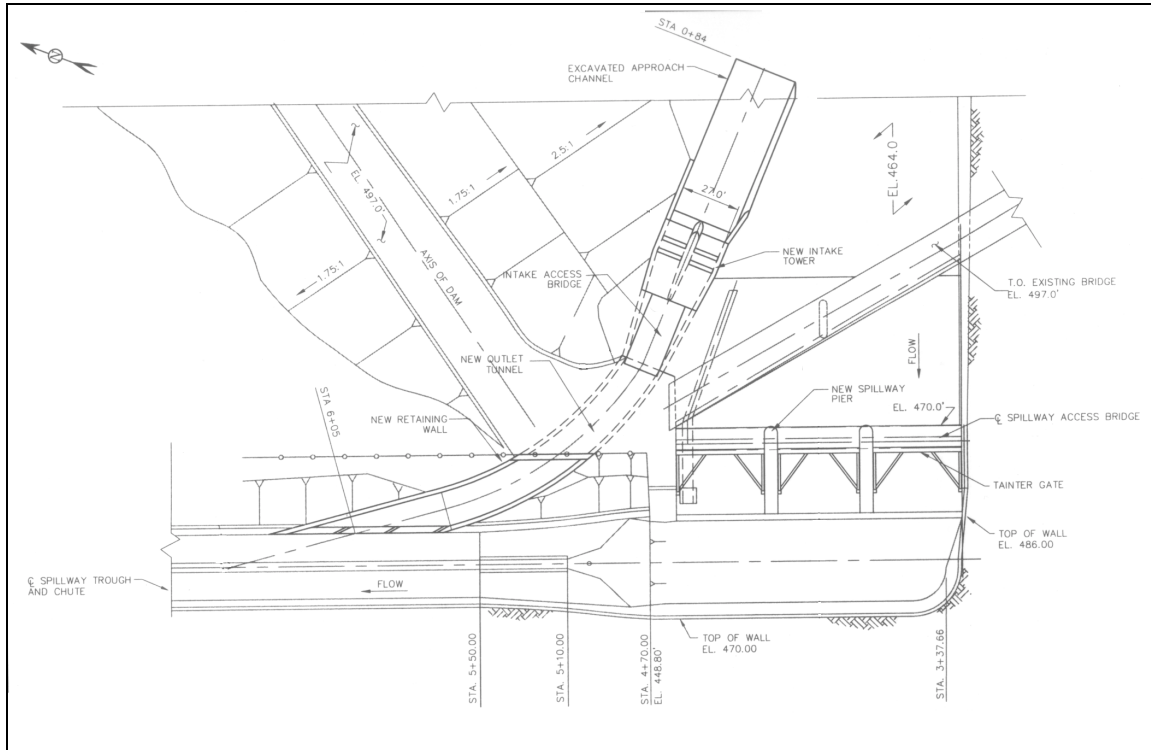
Proposed Skookumchuck Dam Outlet Structure and Spillway Modifications
